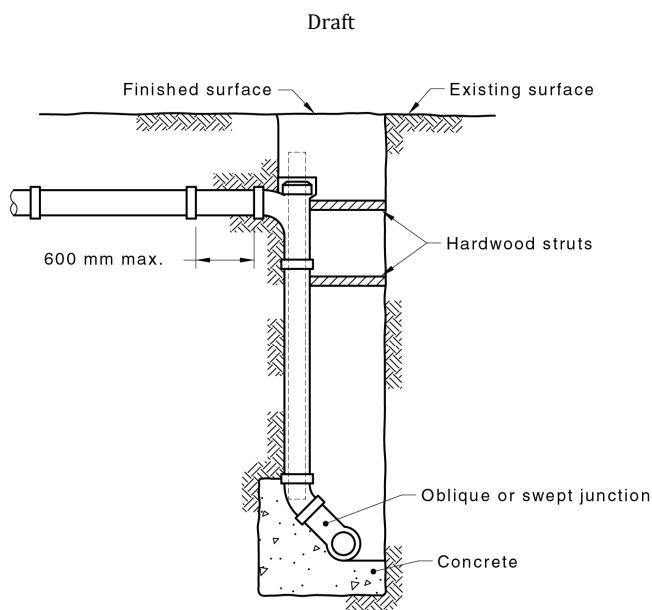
Vertical jump-up to branch site stormwater drain
